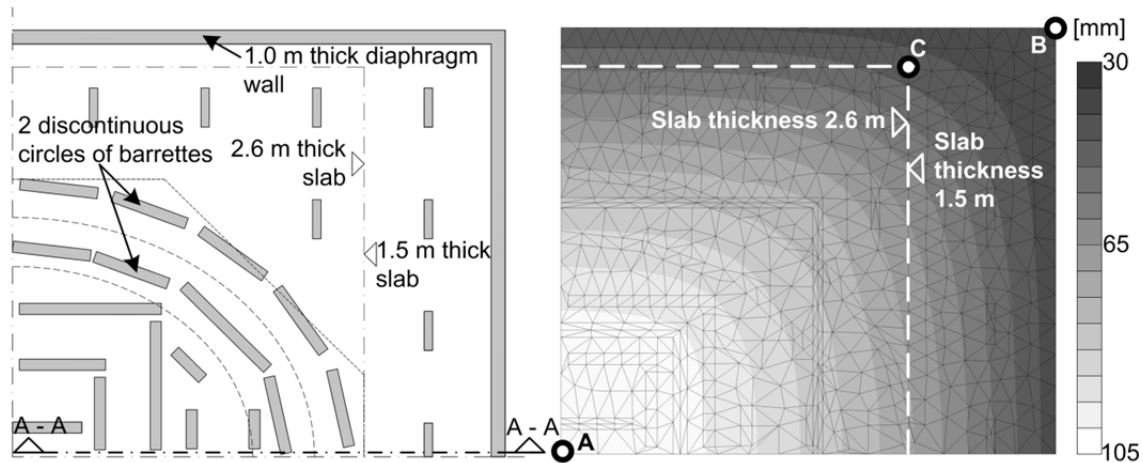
Top view of layout 5 (final / executed foundation concept)
